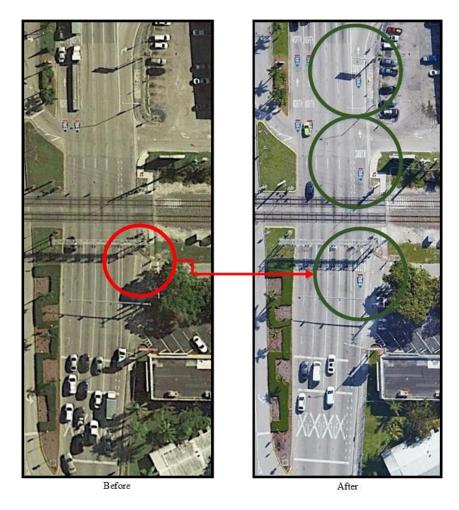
Countermeasures implemented at Site 4 (W Hallandale Beach Blvd @ I-95, Pembroke Park, FL)
